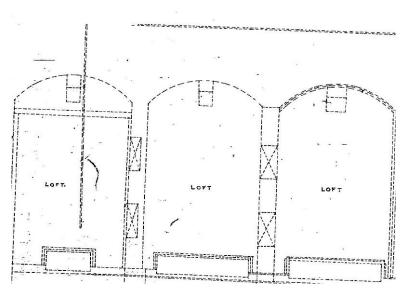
Full extent of vault 7 seen here are 8 and 9 to the right. Note access to the south route that divided (source: G.W.R Paddington Station Improvements: Bishops Road Station, Goods and Taxi Approach Roads. General Plan of Reinforced Concrete Work, Contract No. 11, Drawing No. 2)
